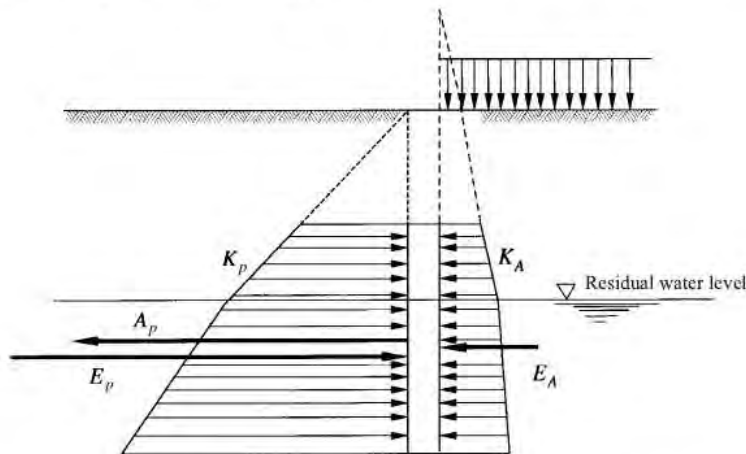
External Forces Acting on Concrete Wall Anchorage
